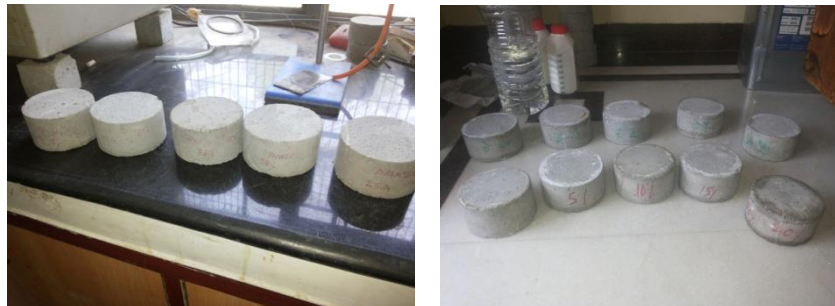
Cylindrical Specimens of Size 51 mm x 100 mm
